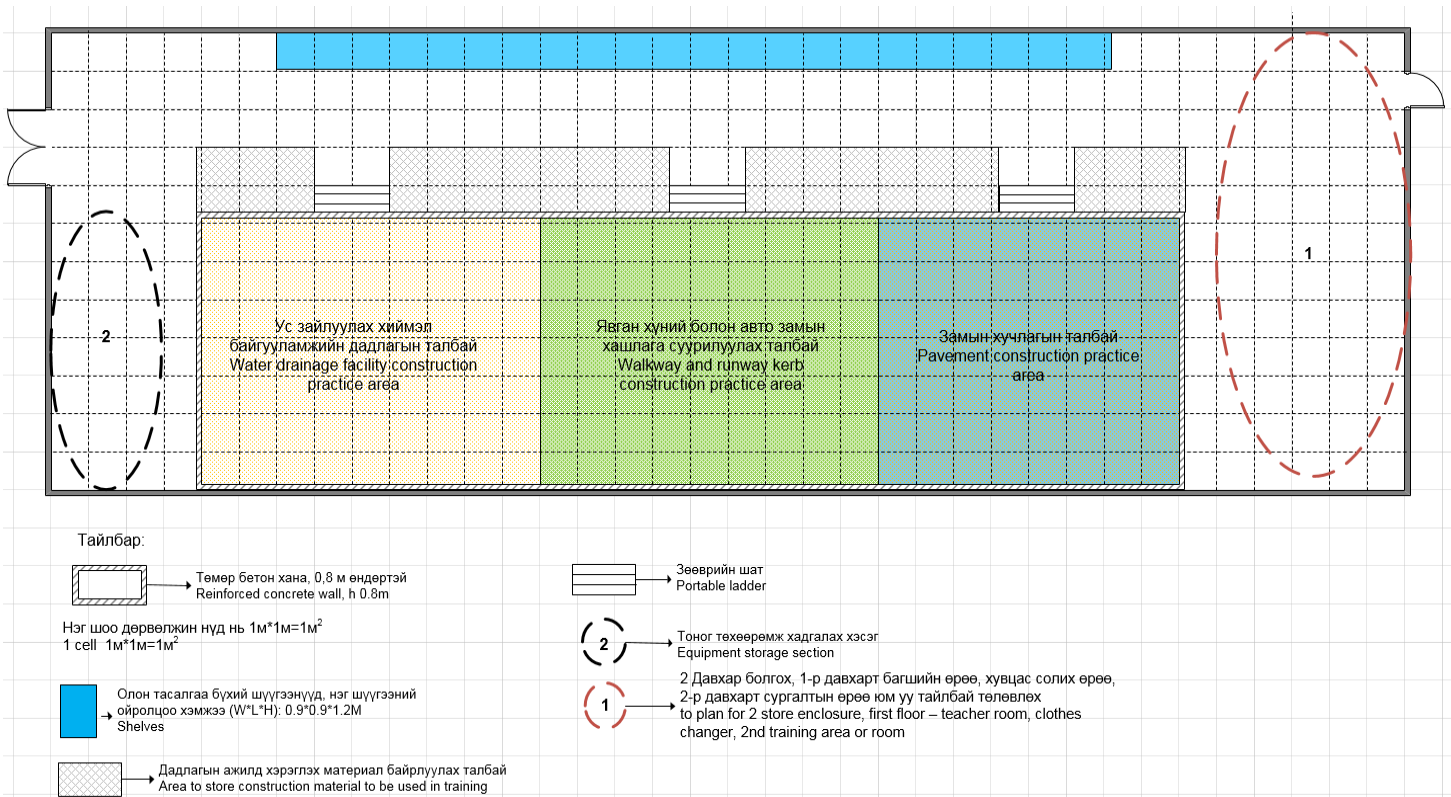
PRELIMINARY DETAIL – REPAIR WORKS - ROAD AND BRIDGE CONSTRUCTION WORKER SHOP, 36M X 12M (yellow highlighted section, height about 9 meters, the red dashed line circled area – to plan 2 story enclosure)
